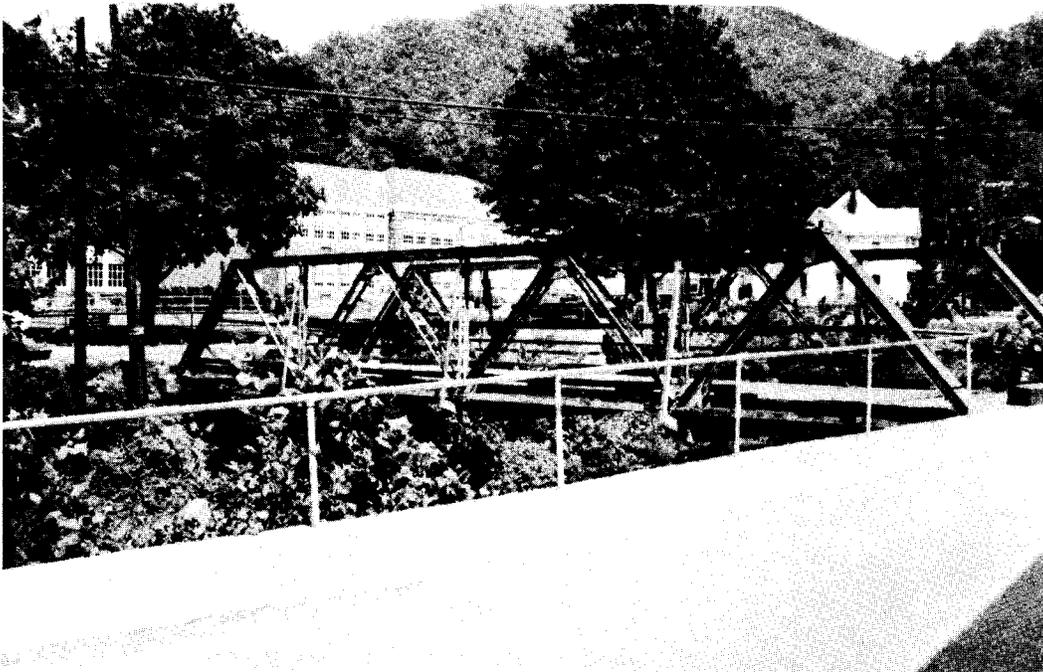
A typical twentieth century pony truss with riveted connections built by HIPCO Steel Bridges in 1925.
